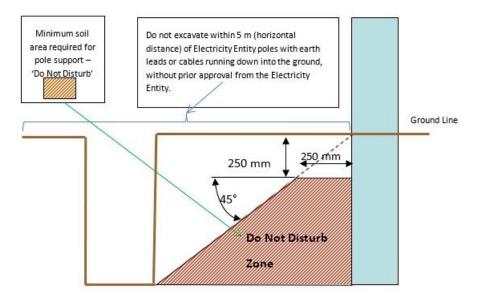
Do Not Disturb Zone requirements when excavating near poles
